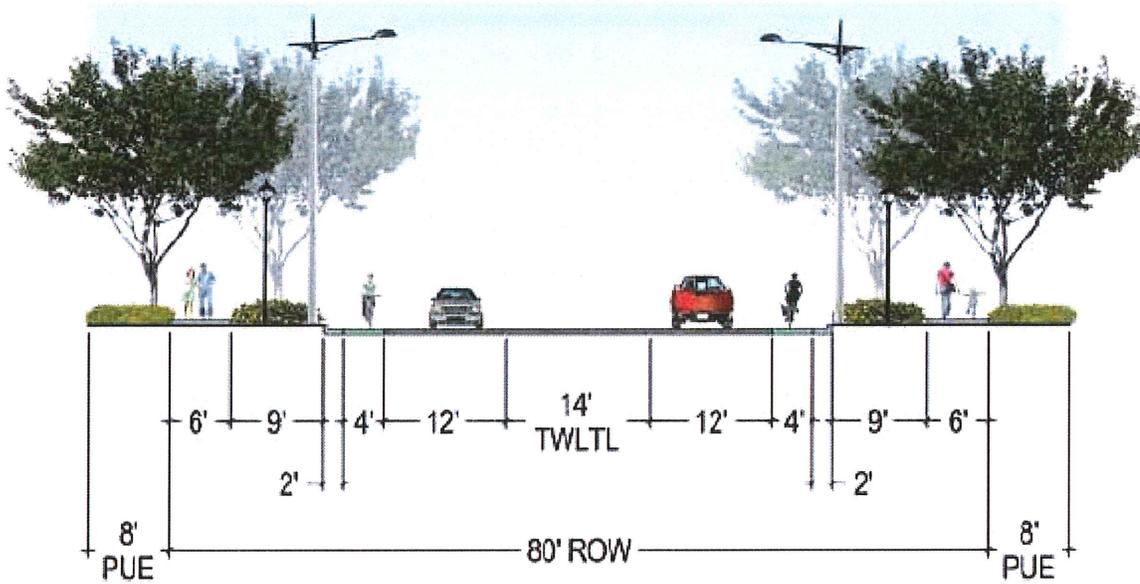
Roosevelt Street – Avondale Boulevard to 113th Avenue Cross-section 4
